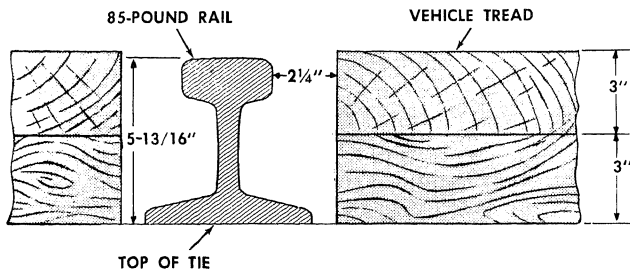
Decking of through-type panel railway bridge, detail of vehicle tread for combination highway-railway bridge.
